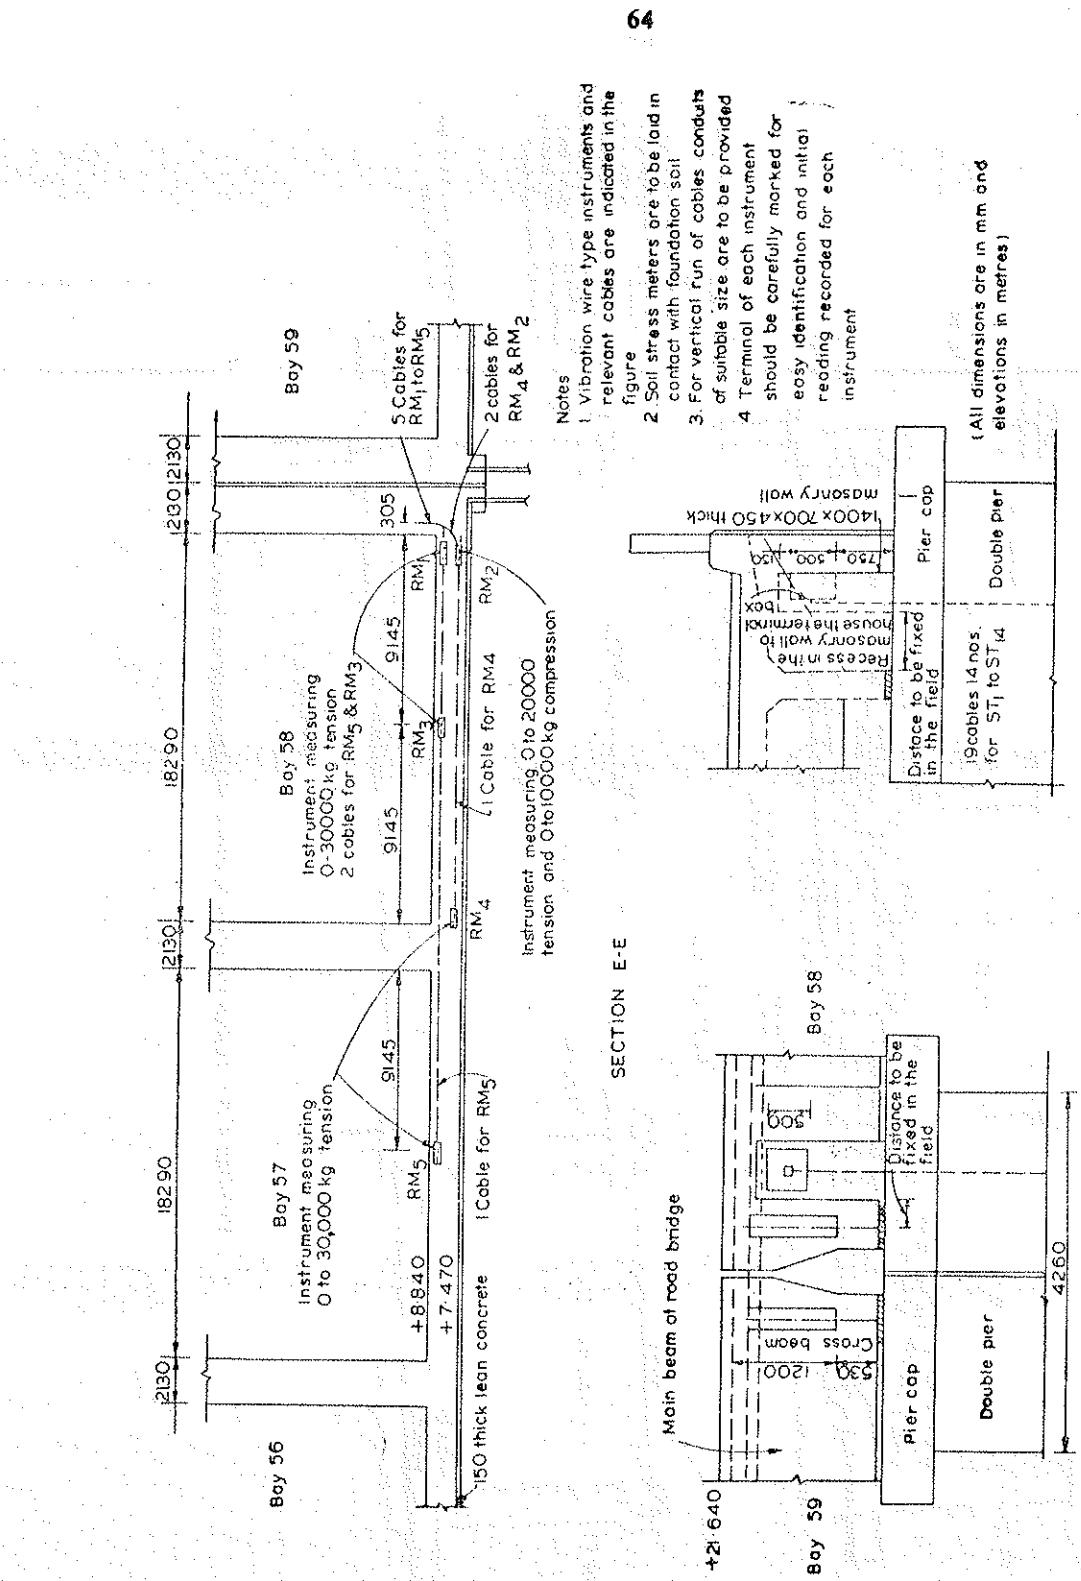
Typical Details Location of Instruments and Recording Point.
